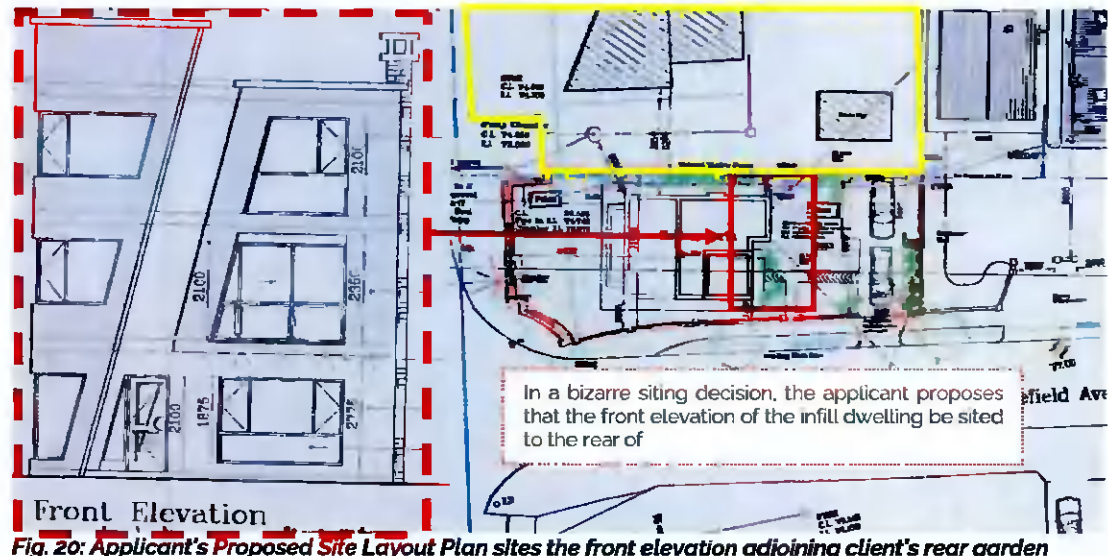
Applicant's Proposed Site Layout Plan sites the front elevation adjoining client's rear garden
